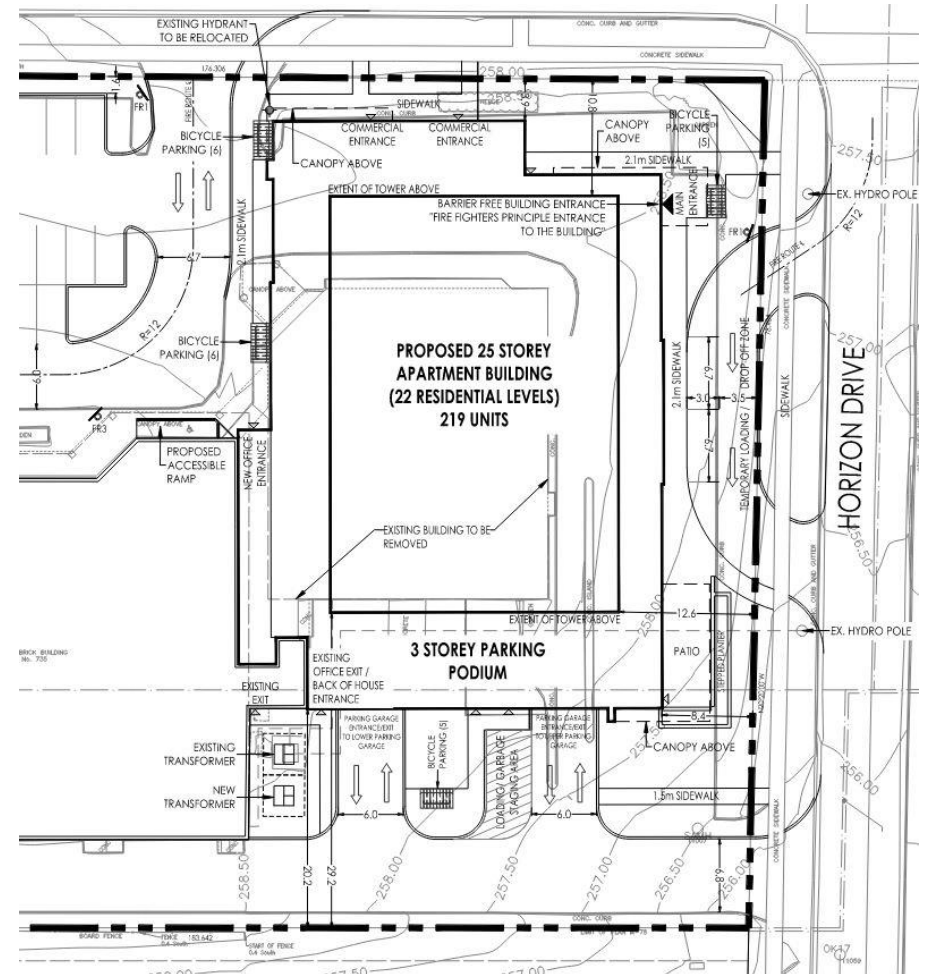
Proposed Development – Site Plan of Proposed Building at the intersection of Beaverbrook Ave. and Horizon Dr.
